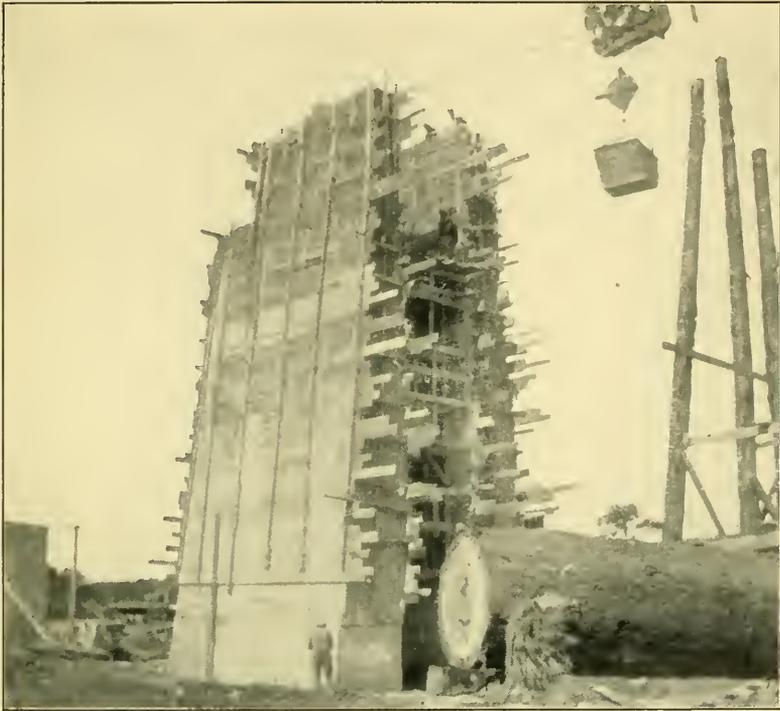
SOUTH ABUTMENT. SHOWING METHOD OF PLACING CONCRETE IN FINISHING ABUTMENT. TOTAL HEIGHT, 57 FT. (ABOVE GROUND, 45 FT.)
